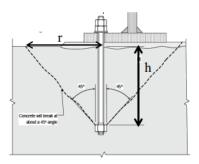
Anchor Bolt Concrete Failure [6]
